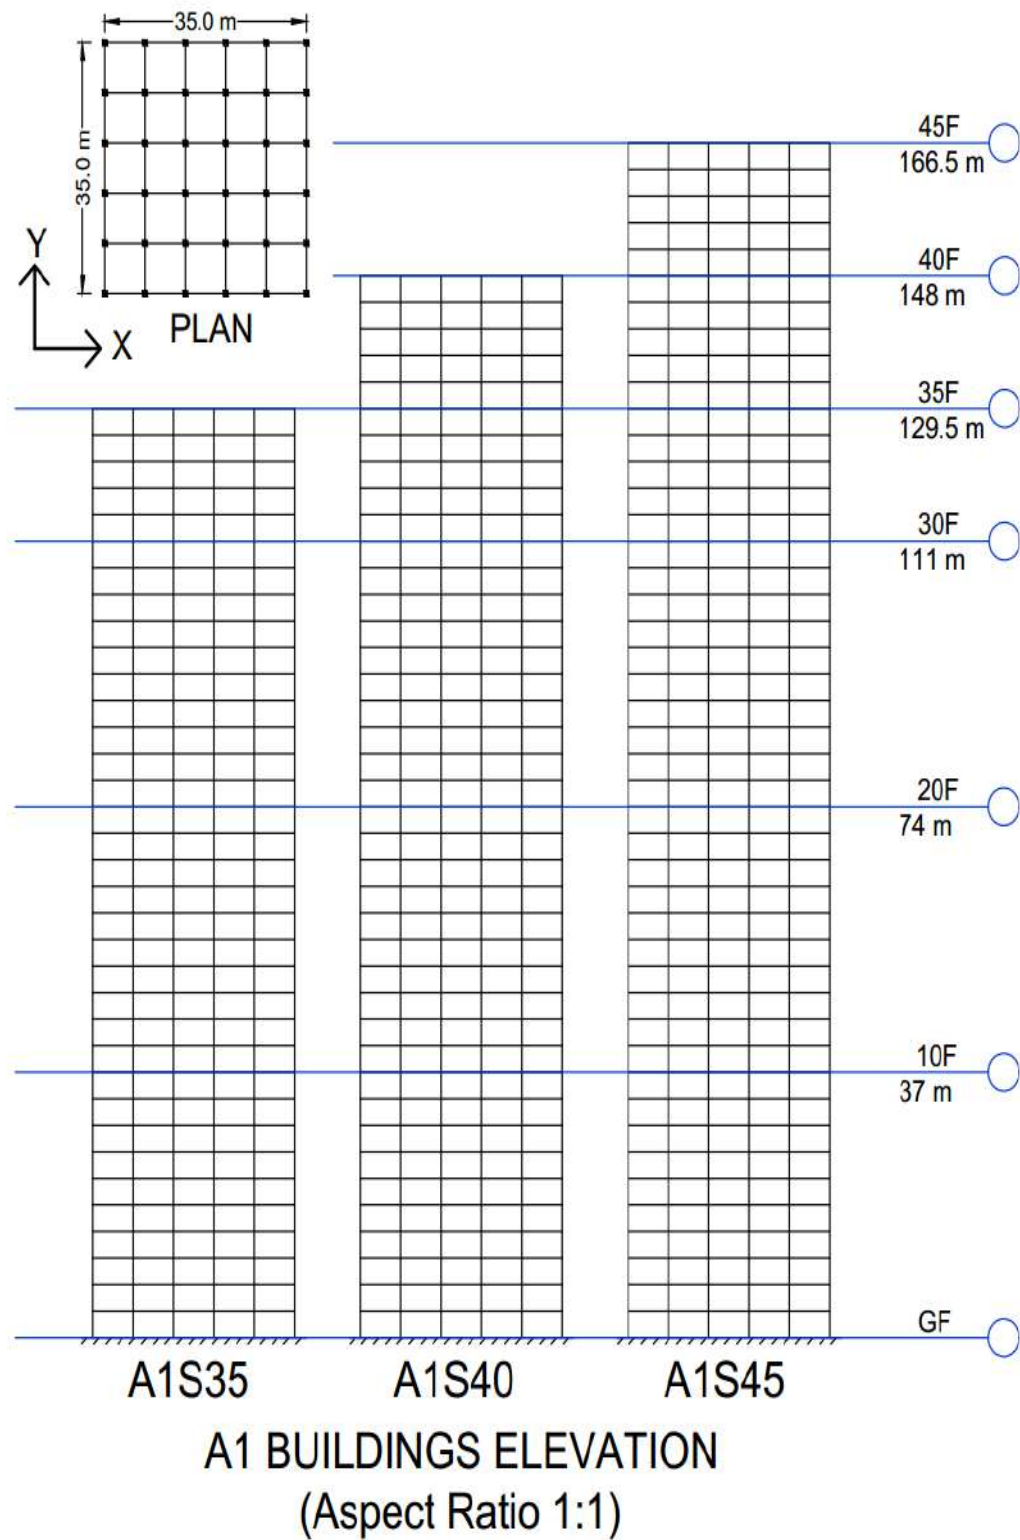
Plan and Elevation A1 Type Buildings (Aspect Ratio = 1:1)
